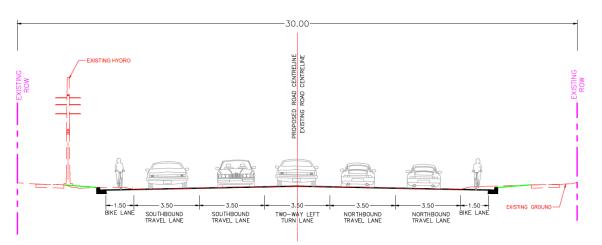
Alternative Design Concept Matheson Boulevard West to Britannia Road West
